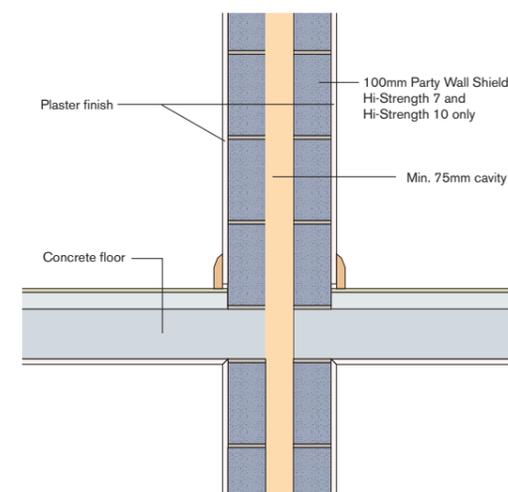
& 4 - Typical junction of partial fill separating walls with intermediate floors
